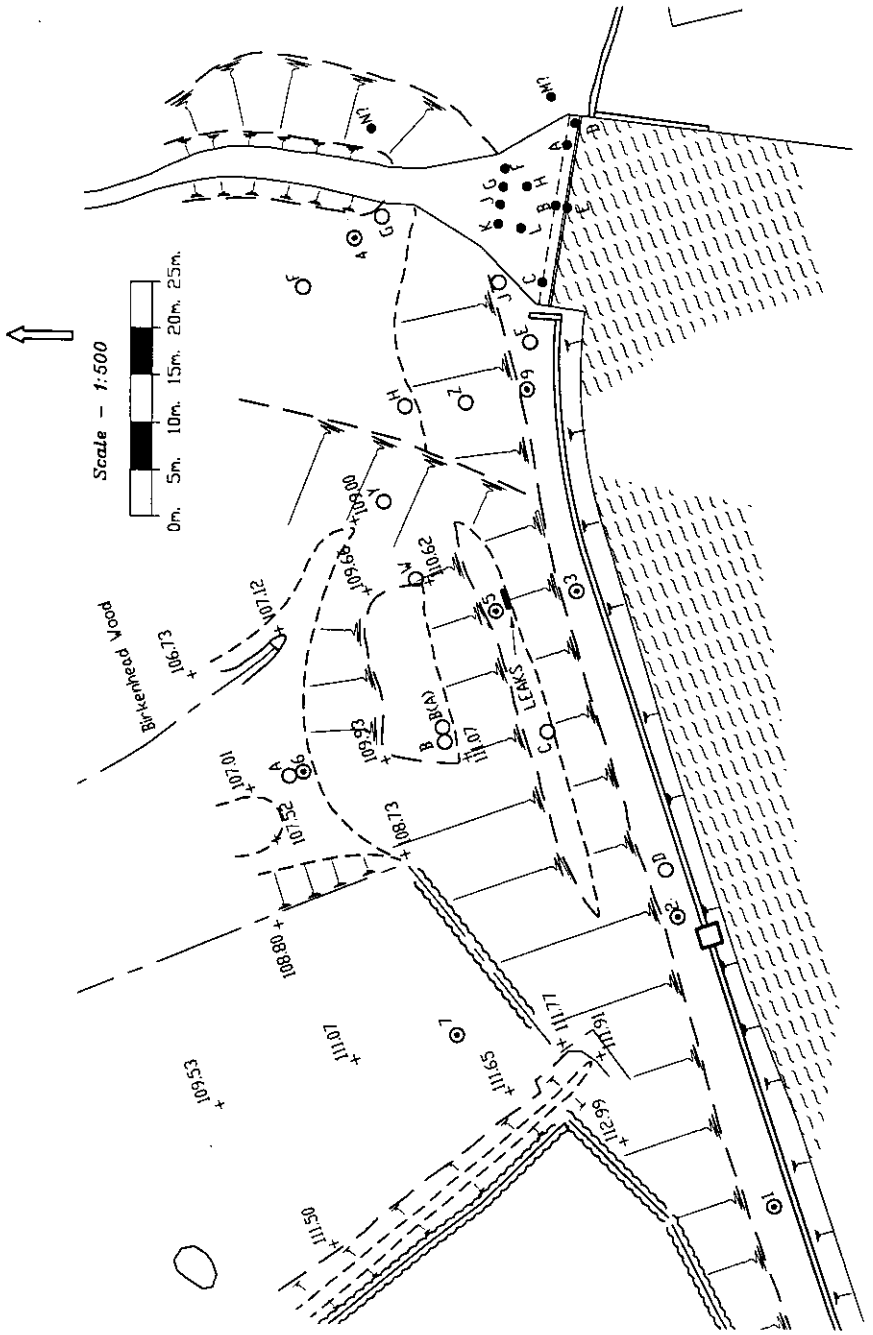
Plan of Pebley dam showing location of boreholes and leaks
